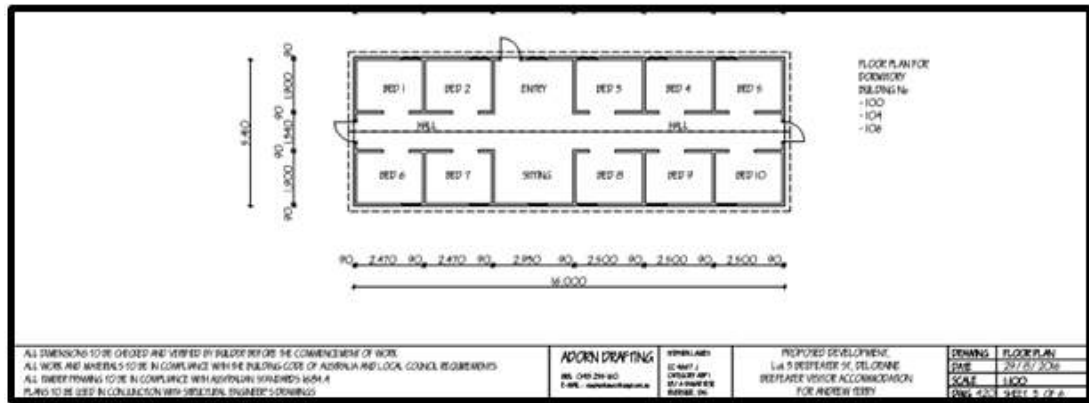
Dormitory layout (Adorn Drafting, 2016)
